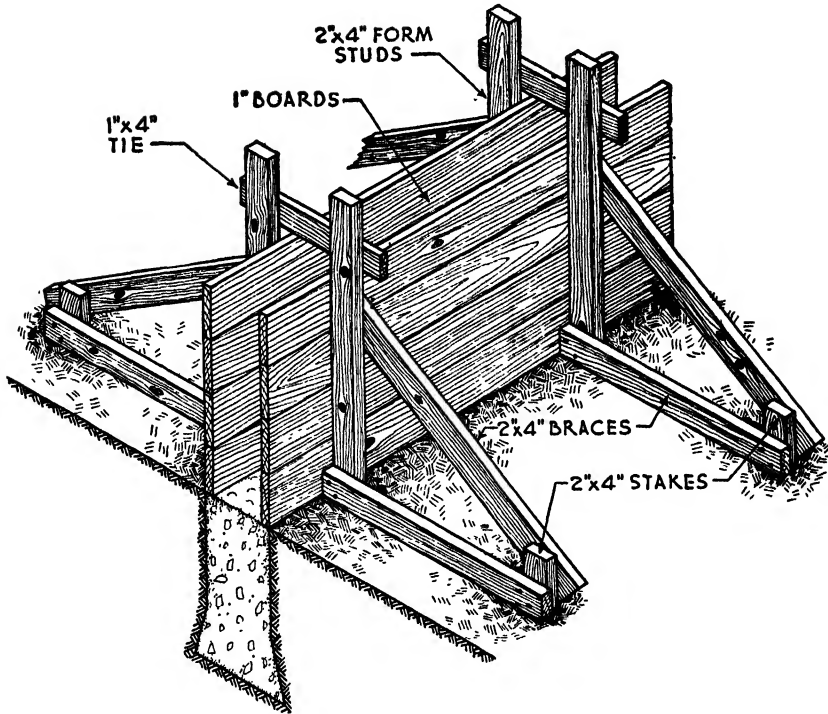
Foundation wall forms may be made in this manner provided the soil does not crumble or cave and a wide footing is not required. (Portland Cement Association)
